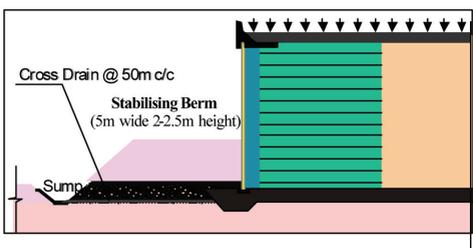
Drainage arrangement detail and stabilizing berm above 4.0 m height wall for Structure at km 17.4 and 18.094.
